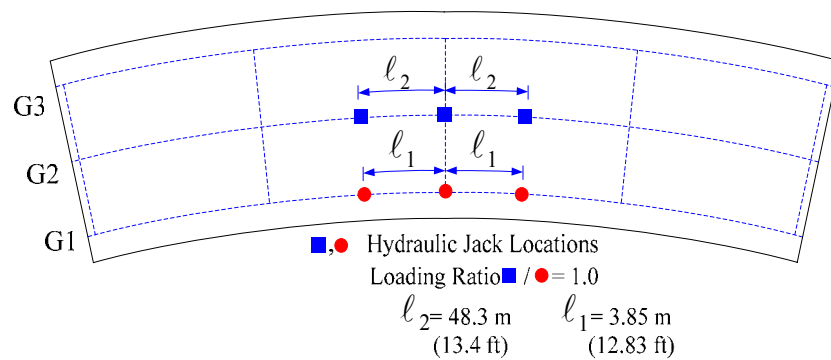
Six hydraulic jacks positioned on the inside lane of the test bridge slab for Test 3, corresponding approximately to a single AASHTO design vehicle plus lane load.
